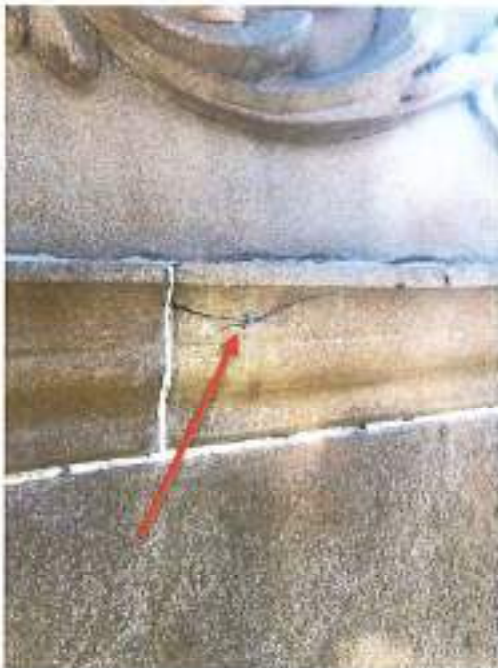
Cracking caused by bird deterrent fixings 3rd floor stringer
